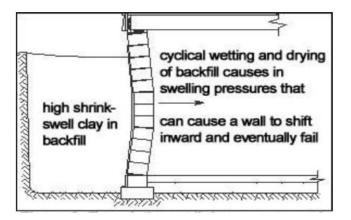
Shrink-swell cycle of Marine clays leading to failure of foundation walls(Fairfax
